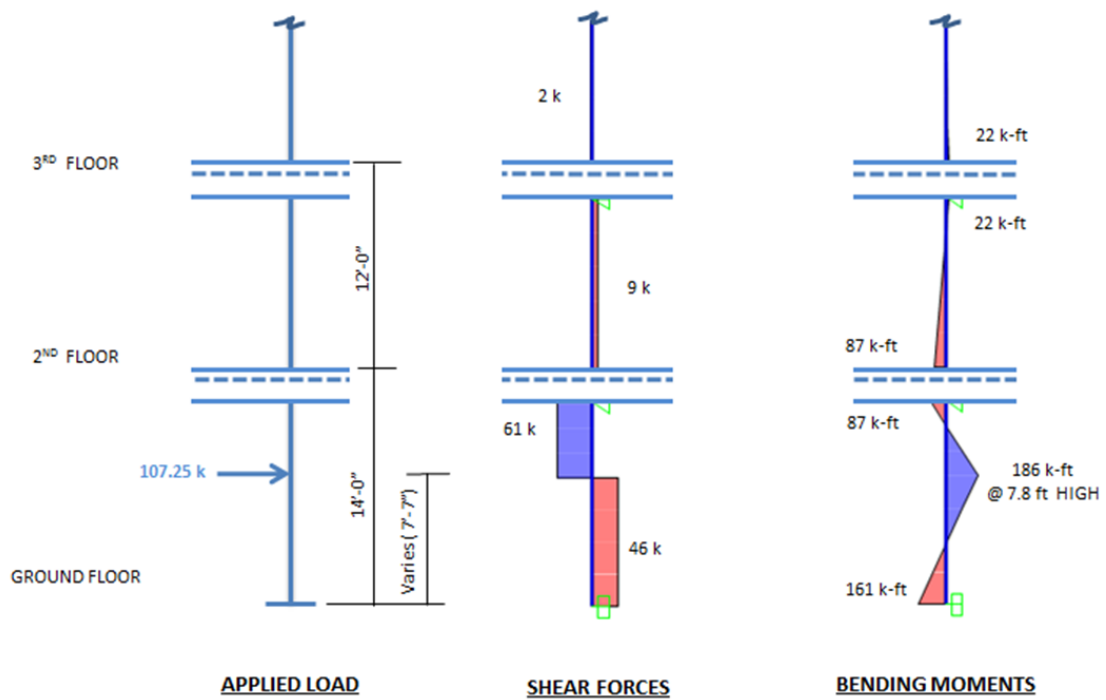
Impact load applied at " $d + h_c$ " away from the end of column on the ground floor
